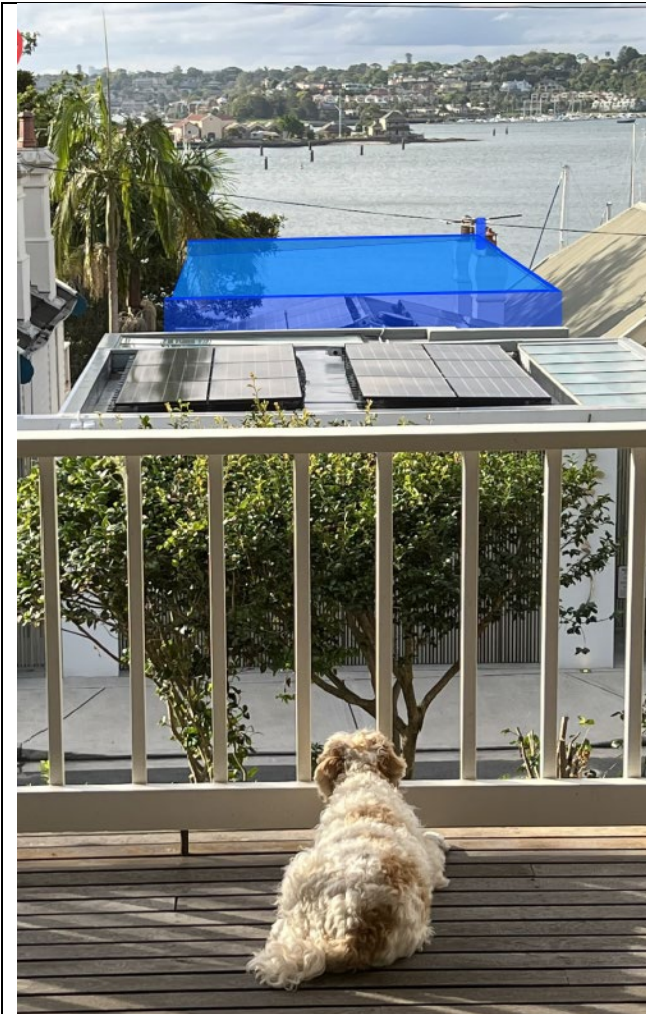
Ground floor Formal Living/Dining, north-west facing views towards Parramatta River. Photo provided by objector; Montage provided by applicant.
